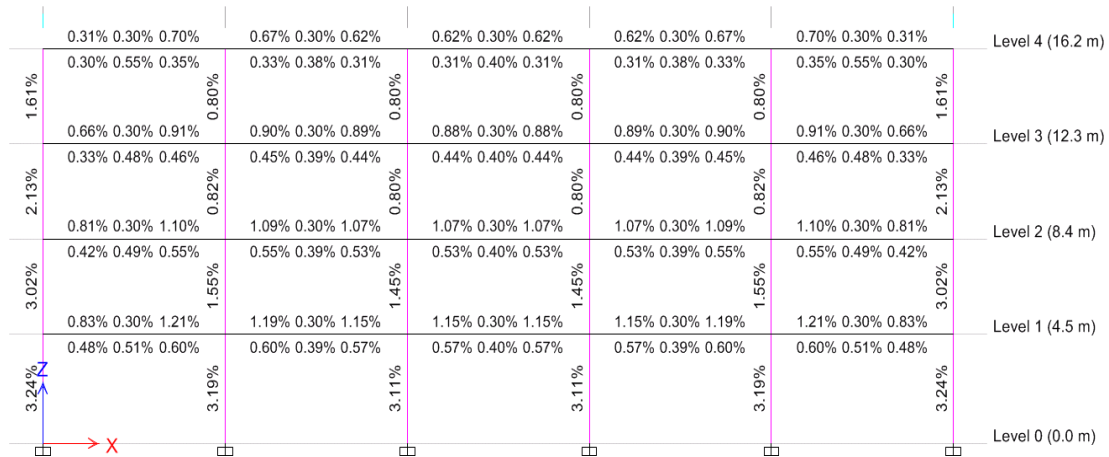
Required longitudinal reinforcement for building ID 2227
